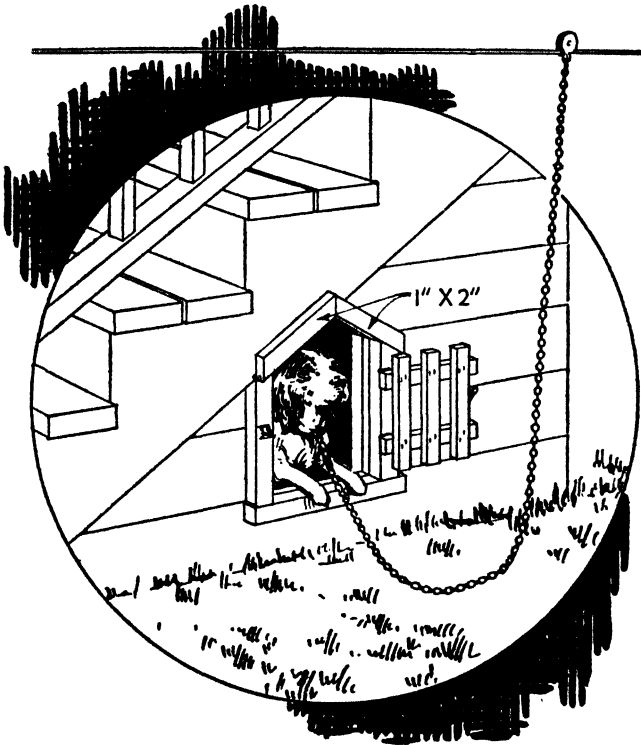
DETAIL OF BACK STEPS KENNEL IN PHOTOGRAPH FIG. 338
